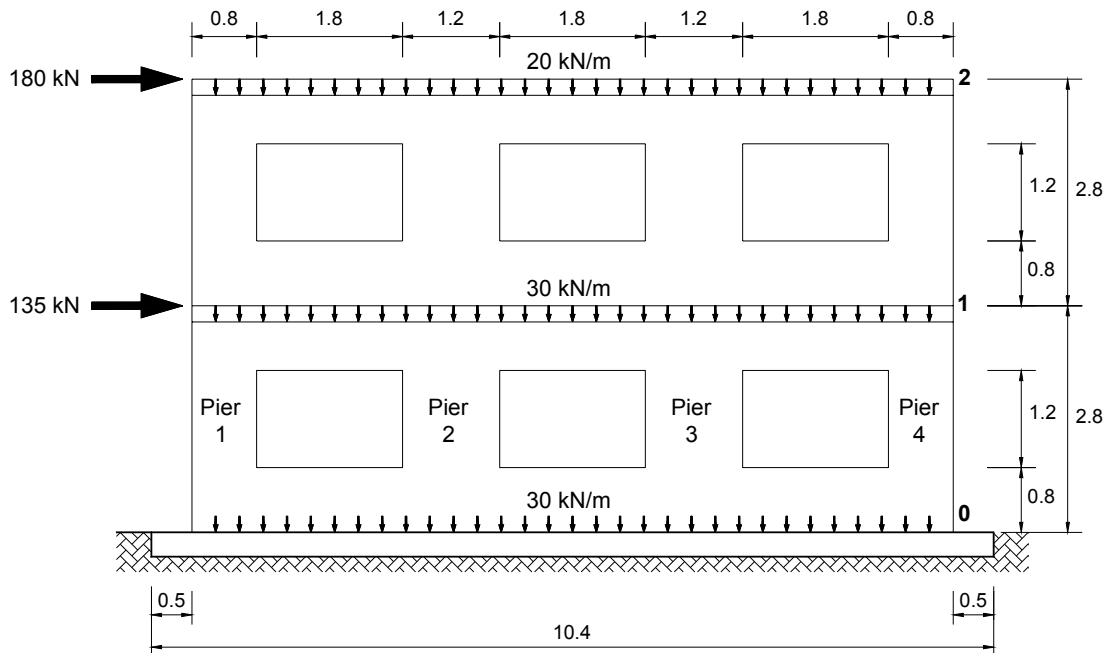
Limited Ductile 2-Storey Masonry Wall with Openings
